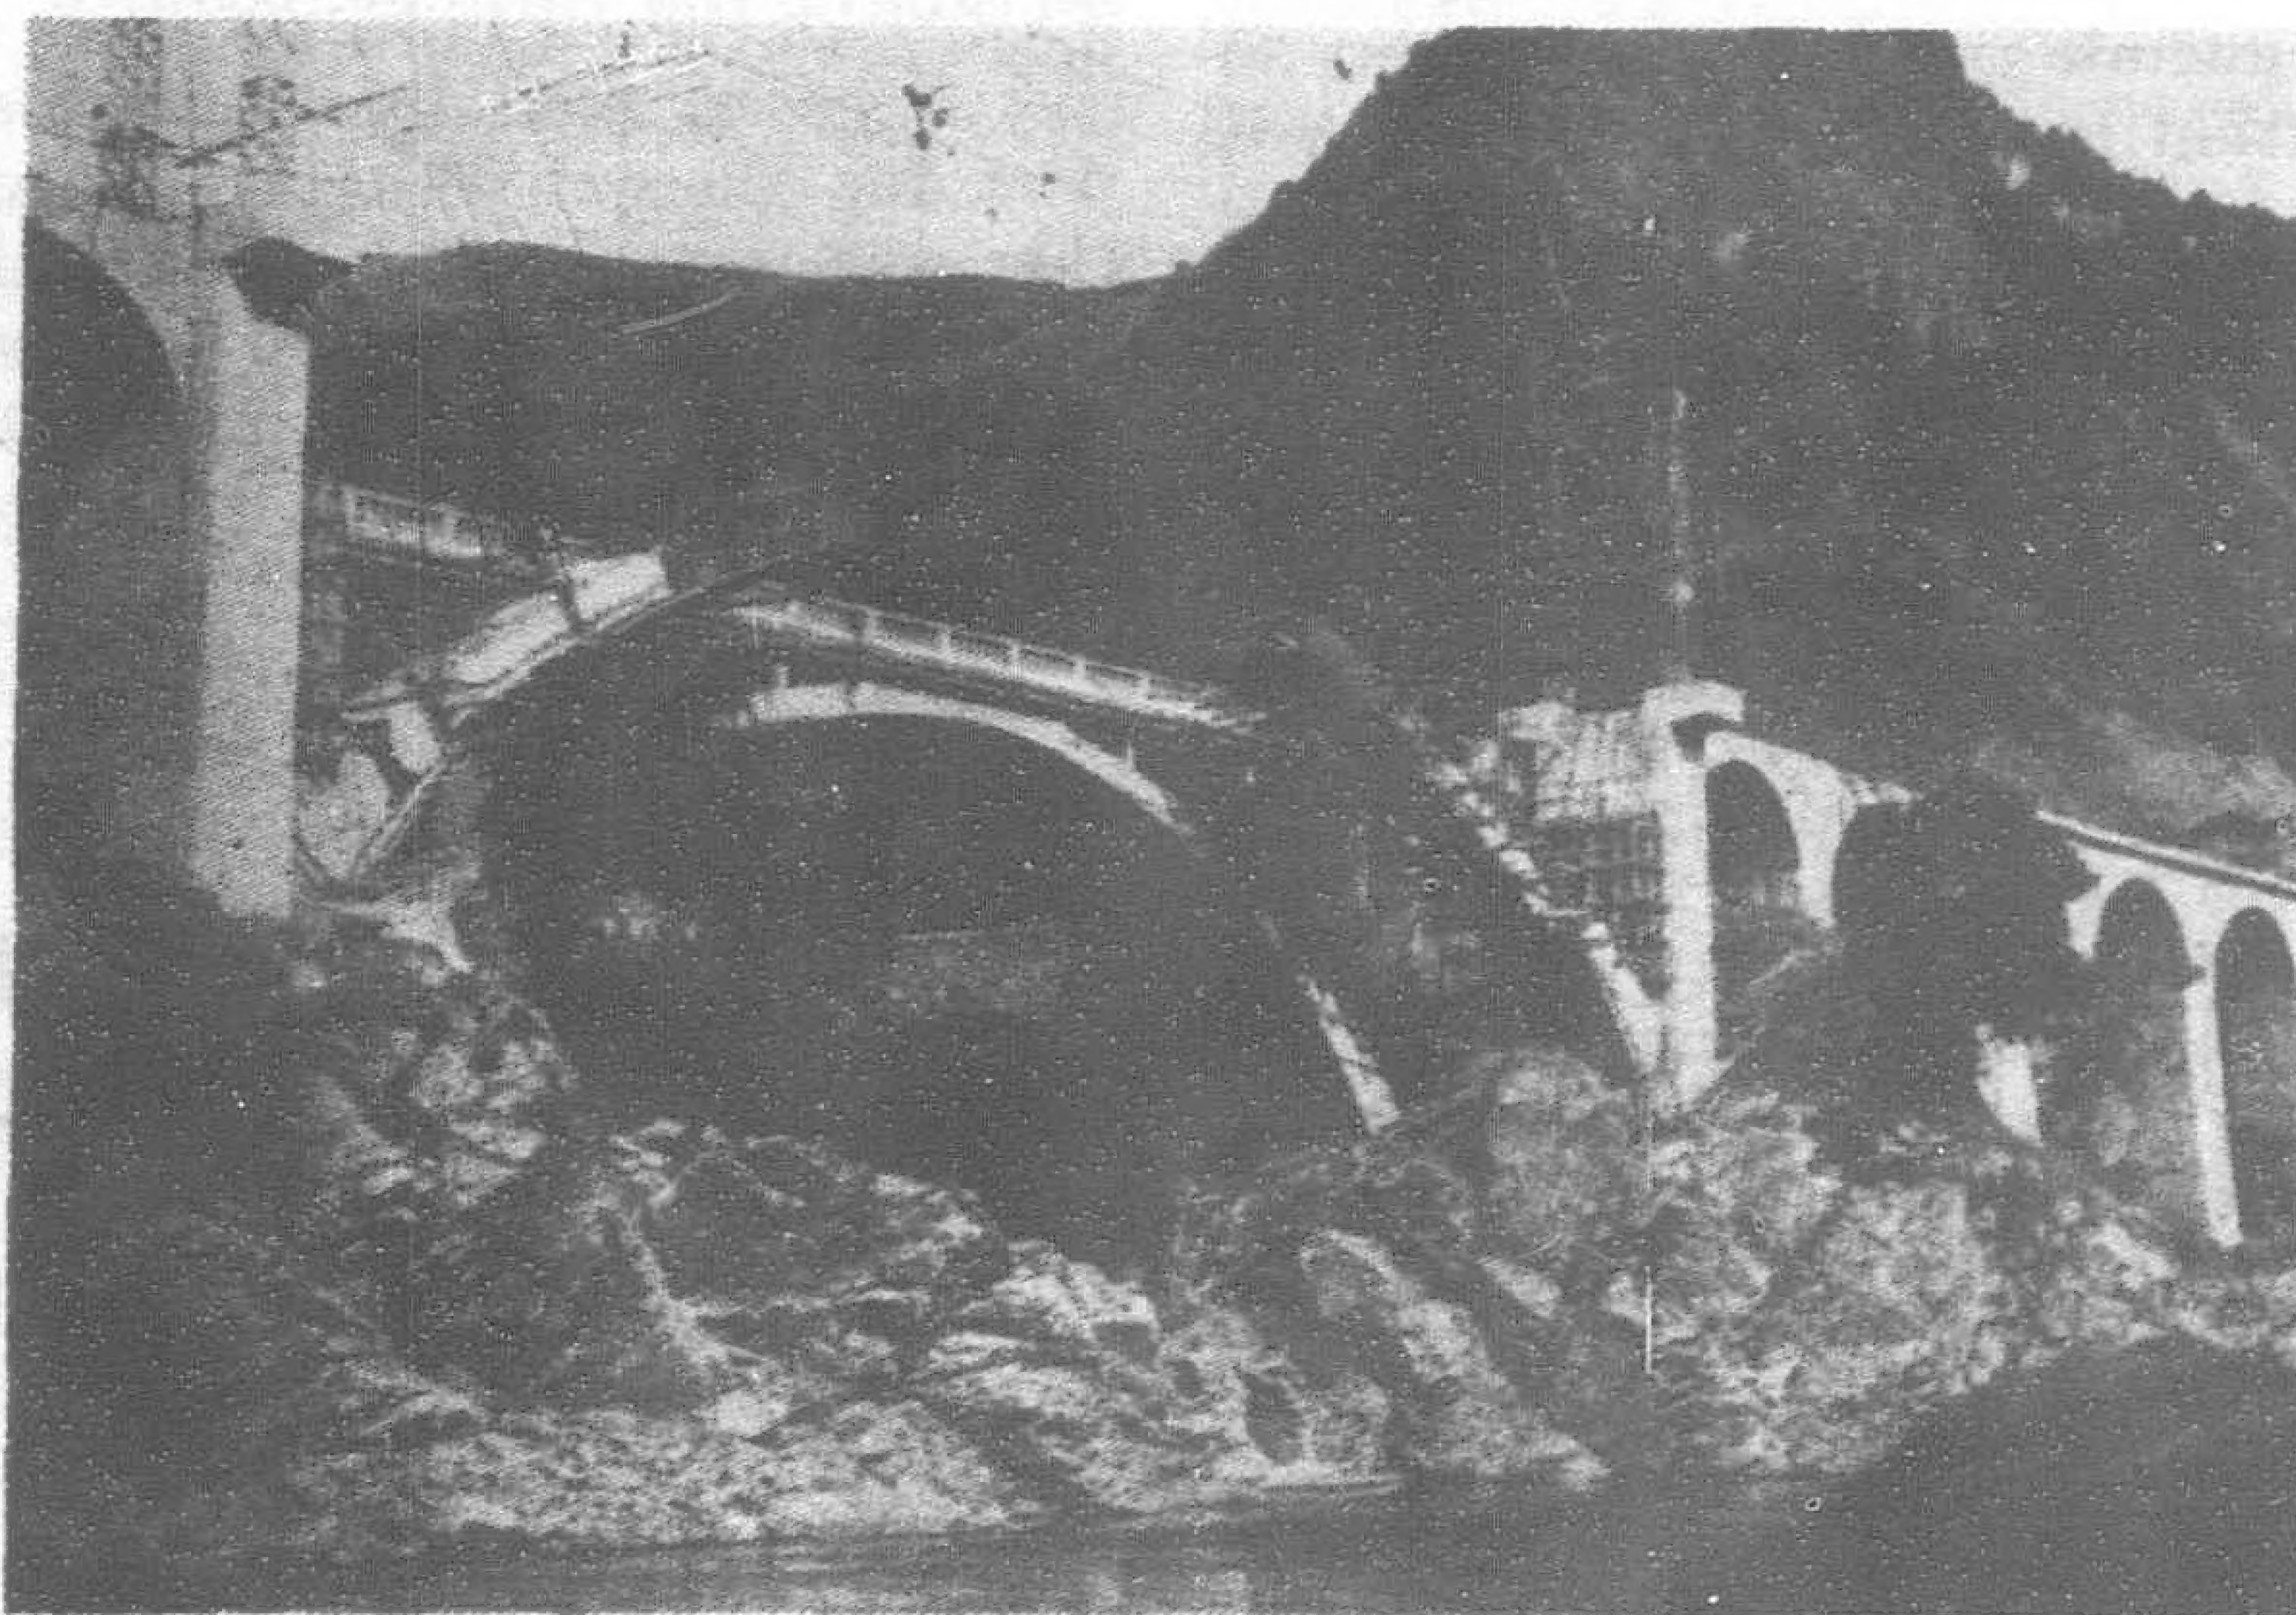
The reinforced concrete bridge at Tsunanose on the Hinokage line, Kyushu, showing the cable section and arch in the course of construction
